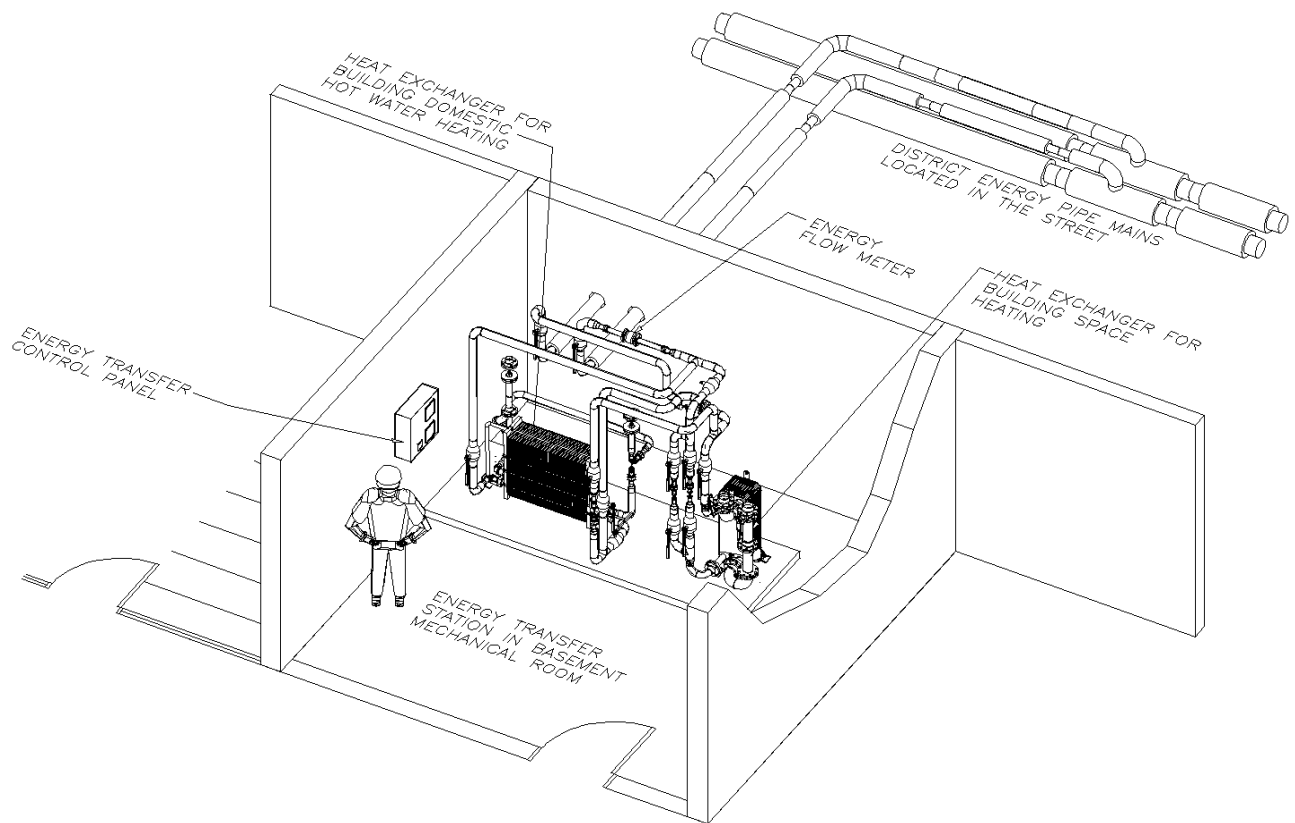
TYPICAL HEATING ETS INSTALLATION IN BUILDING BASEMENT
